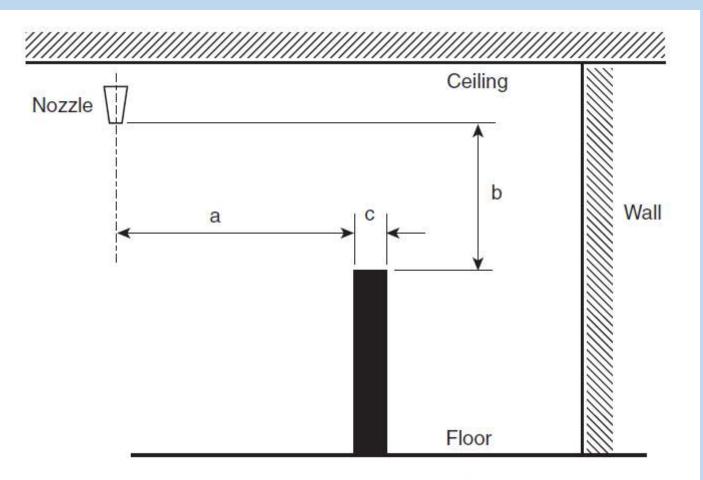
(e) Dimensional Considerations for Suspended or Floor-Mounted Continuous Obstruction Under a Water Mist Nozzle.
